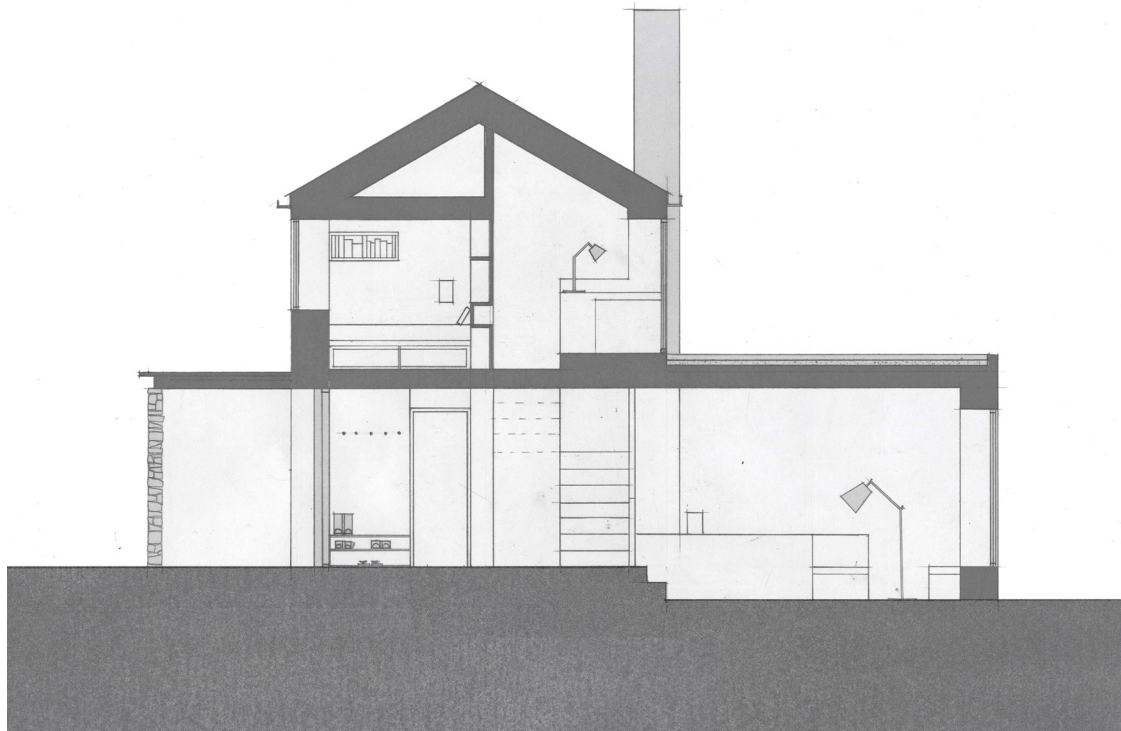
Section through hall, living room box bed and study/play space of 3 bed house type at 1:100
